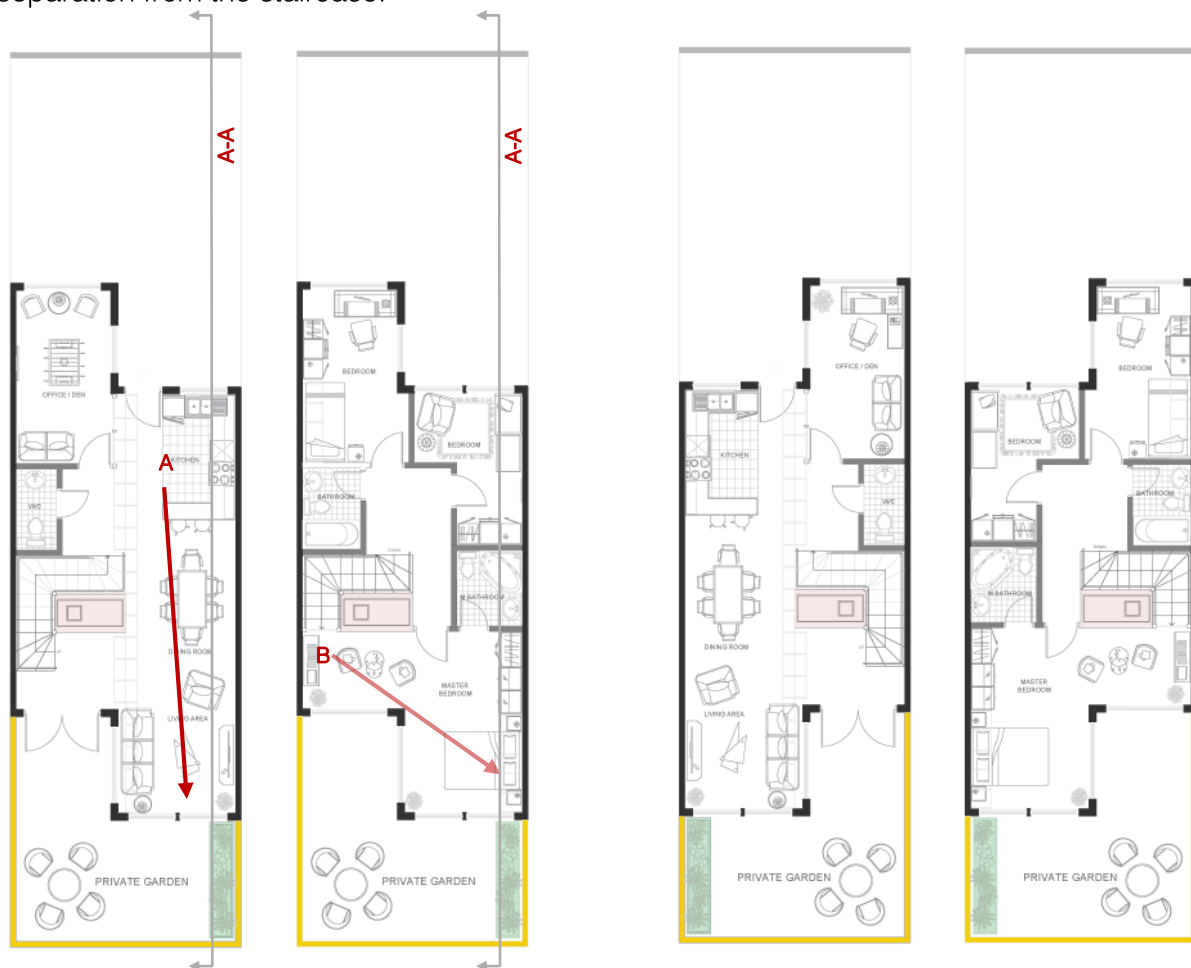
2 Storey Unit Plans. Ground Floor and Second Floor respectively.
